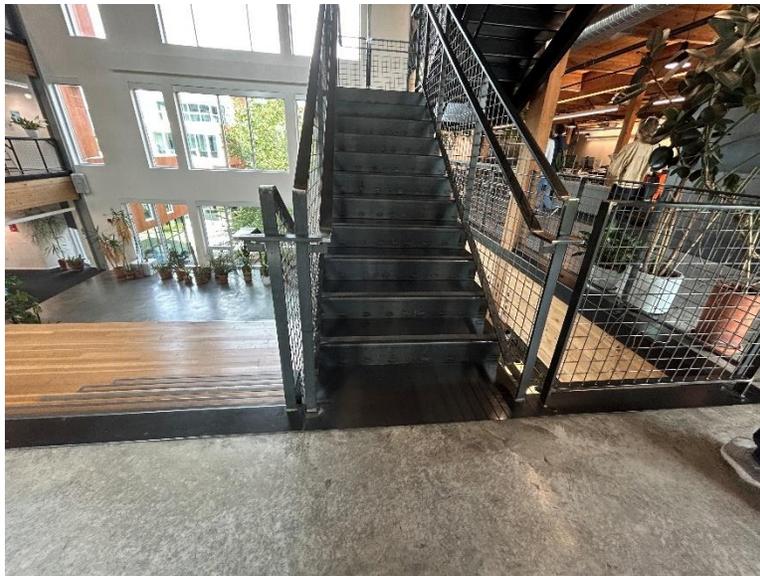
Karuna II East open stairs at tenant space Level 3.
